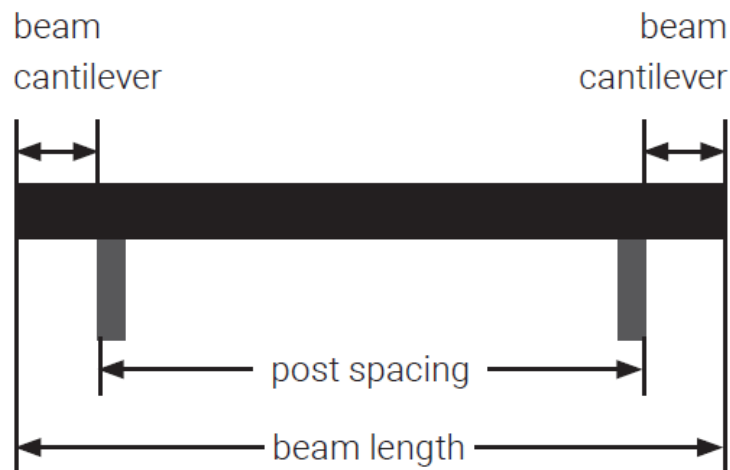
Post Spacing for Support of Beams at Two (2) Locations
